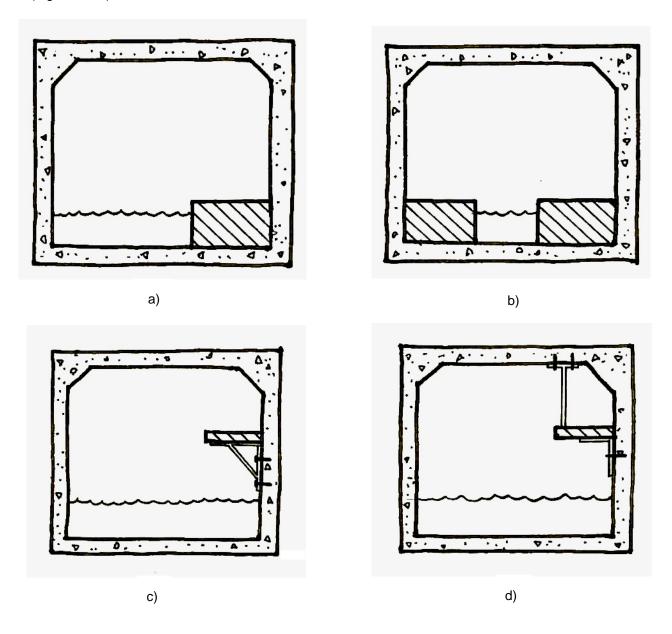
Retrofit of existing box culverts with ledges to provide dry fauna passage.
